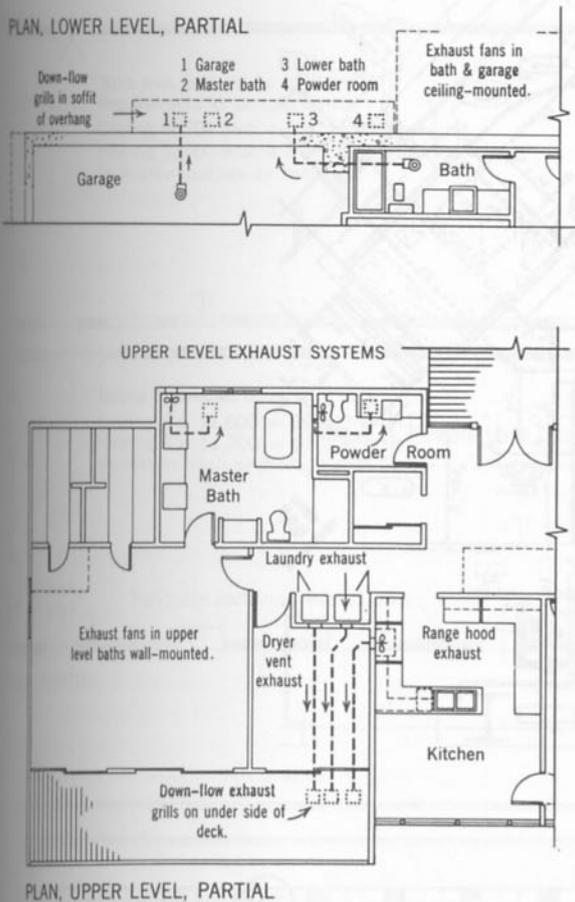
Exhaust ventilation. This design avoids units or ducts that would protrude through exterior walls or roofs. Interior ducts $10 \times 3\frac{1}{4}$ in. between studs or joists carry all exhausted air to inconspicuous down-flow soffit grilles. Dryer vent is self-powered by the fan, which is part of the dryer unit.
